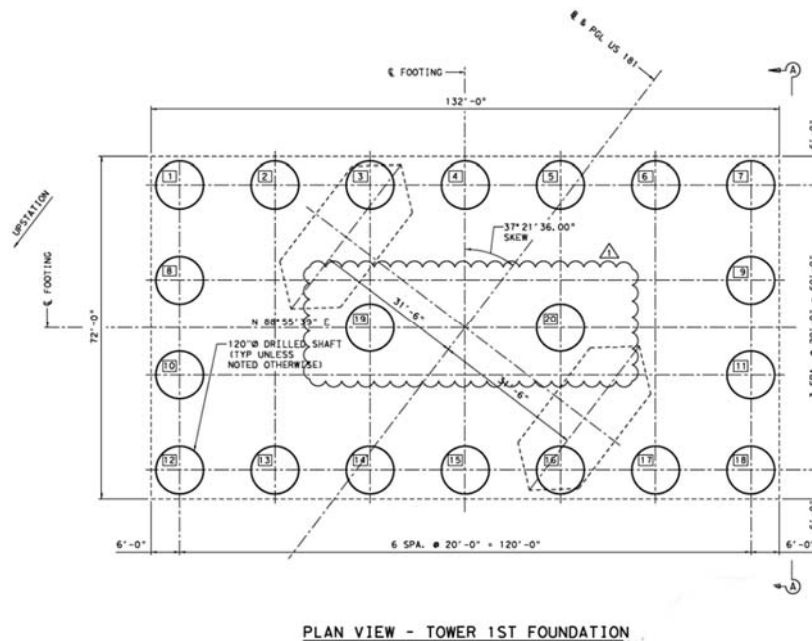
Foundation Cap 1ST, Foundation Cap and Shaft Layout, Drawing NHB-30B (by Others)
